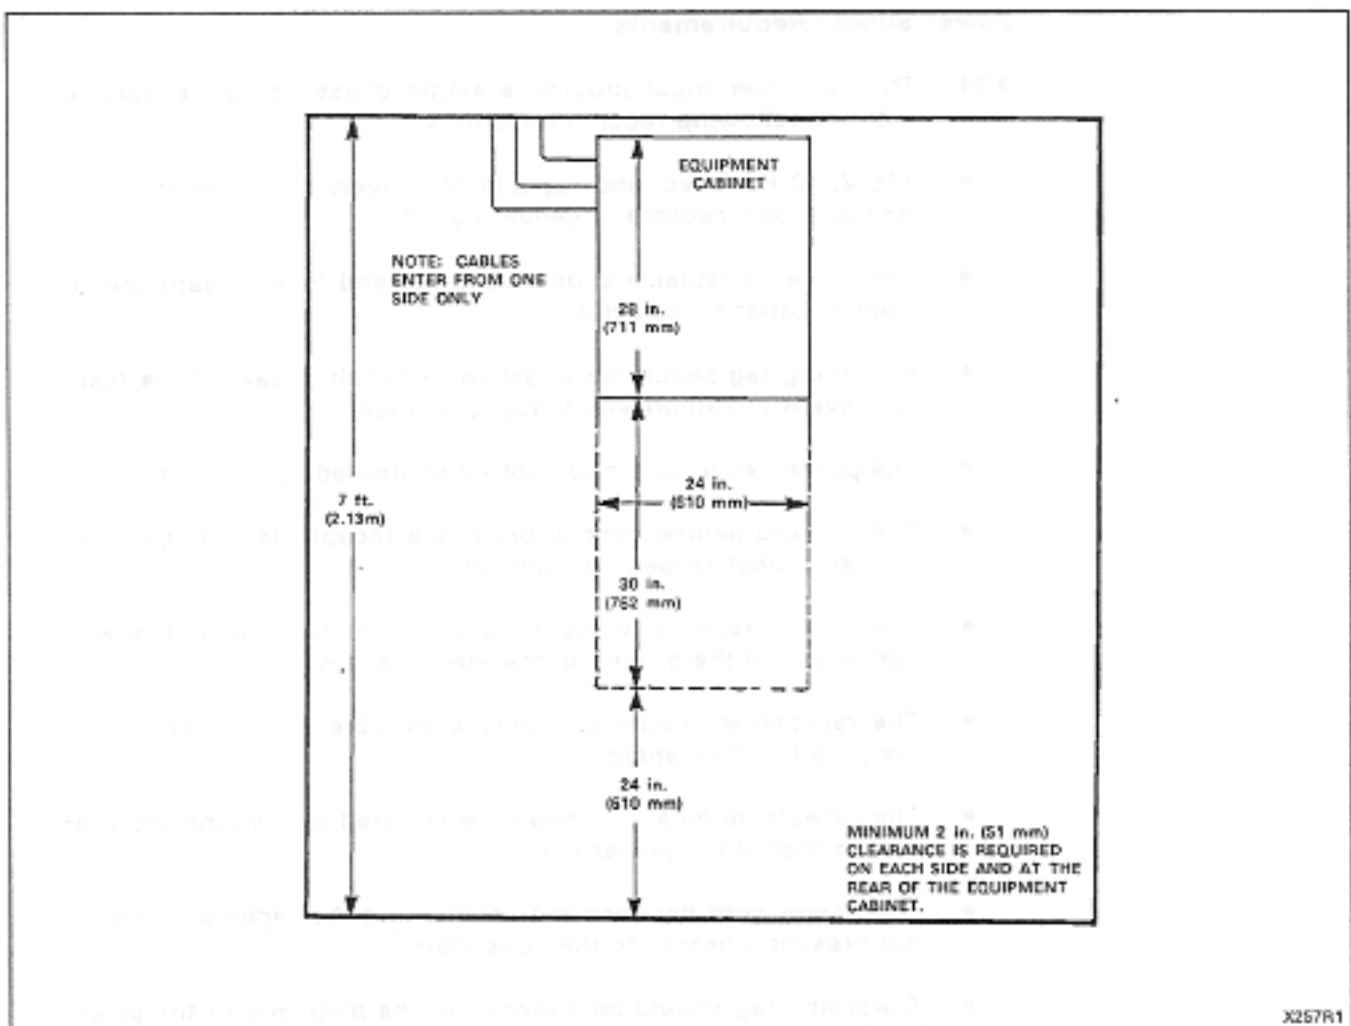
SX-200 Minimum Equipment Cabinet Floor Space Requirements
